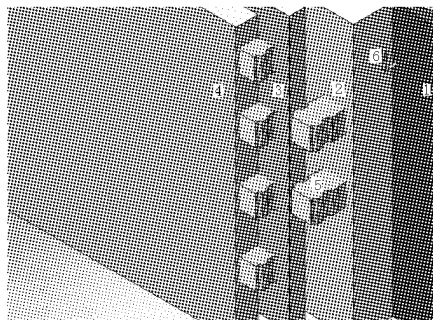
Three-ply structure of fire-resistant Anti-wear layer anchor brick on Side wall
